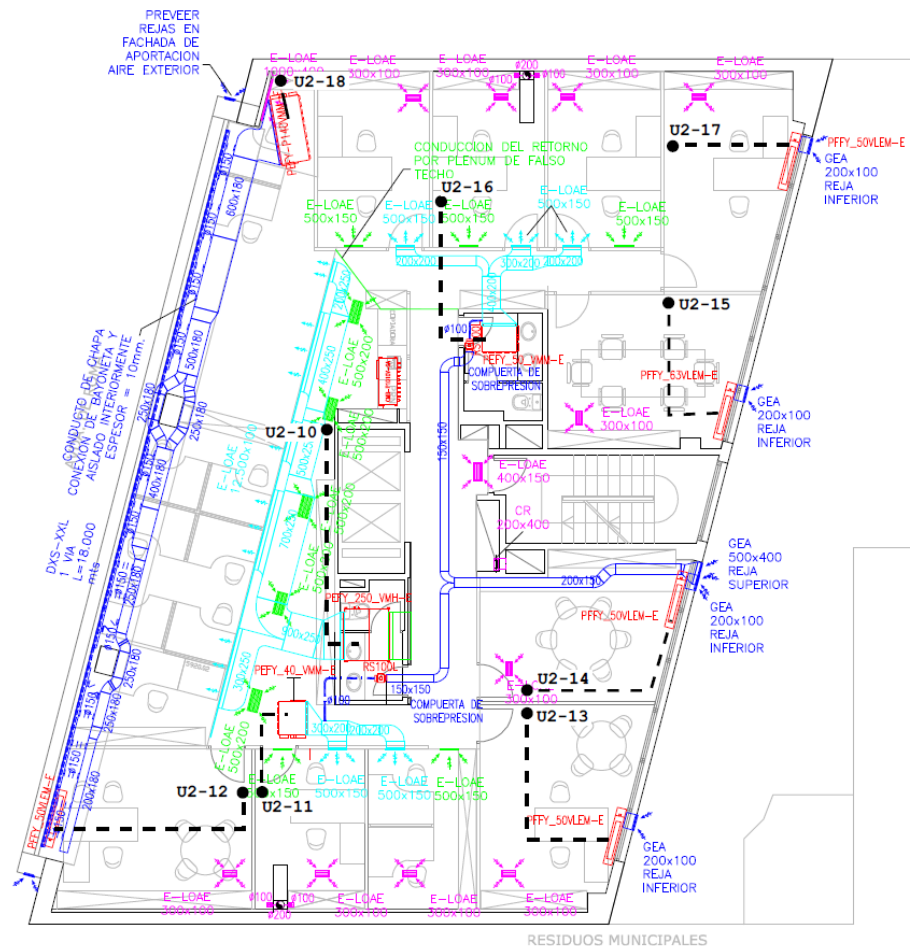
Floor plan for floor 4 of the commercial building. It describes the locations of the indoor units on the floor.
